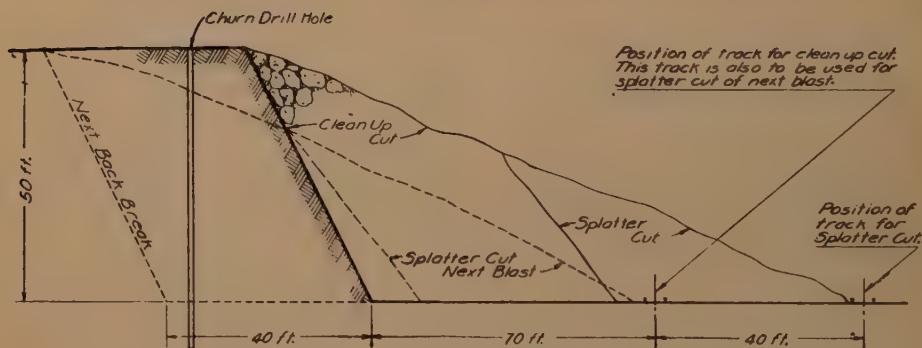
TYPICAL DIAGRAM OF MINING BENCH AND TRACK POSITIONS.
